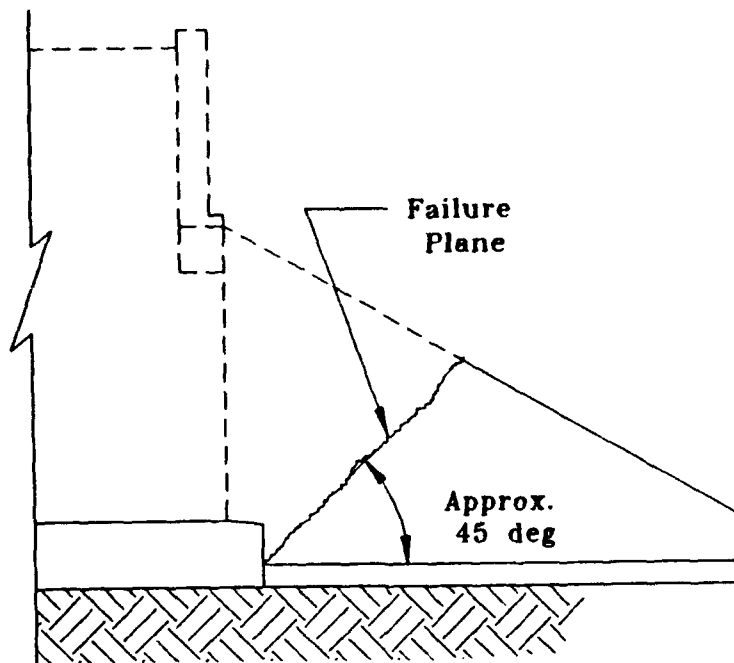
Elevation: Right wingwall failure plane, PAS-3.
